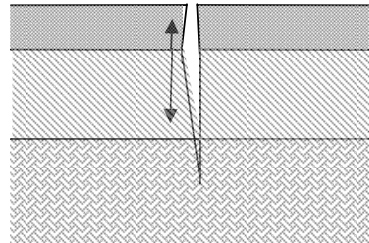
Causes and classification of cracks on asphalt pavement with semi-rigid base
